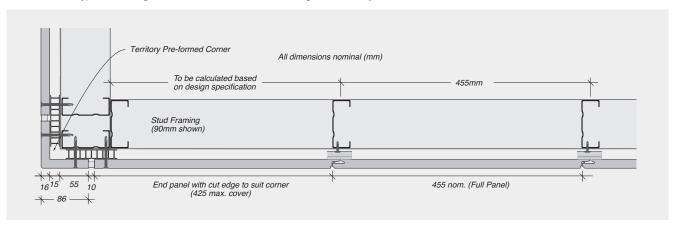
Typical Framing Set-Out with 75mm Steel Framing and Territory Pre-formed Corners – Plan View
